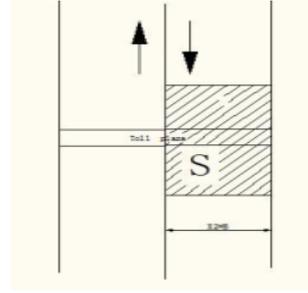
toll plaza area under the maximum floor plan minimum floor plan
